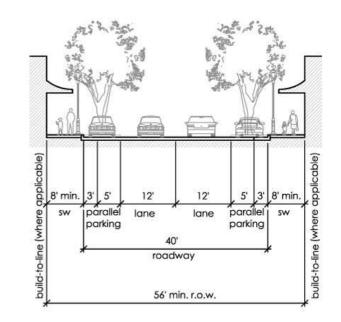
Arterial Street on 30-acre Property (Railroad Avenue)
